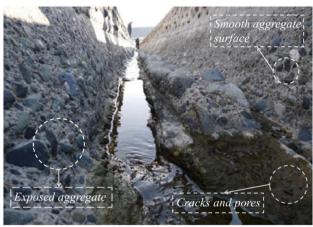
The concrete trough of the sand drainage channel formed by abrasion [5].
